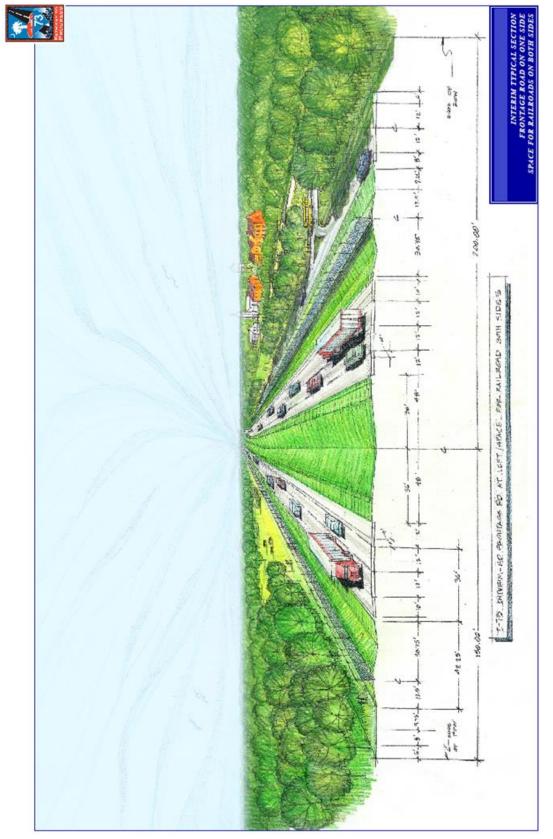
I-73: I-74 to I-95 - Proposed Cross Section
